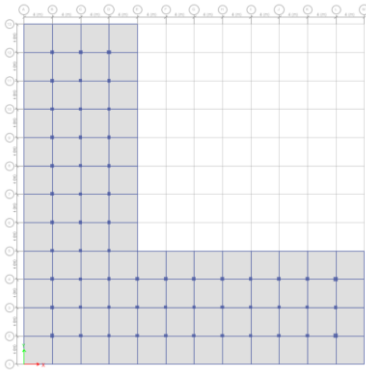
(a) Floor Plan of L-Type Hexagrid Structure
